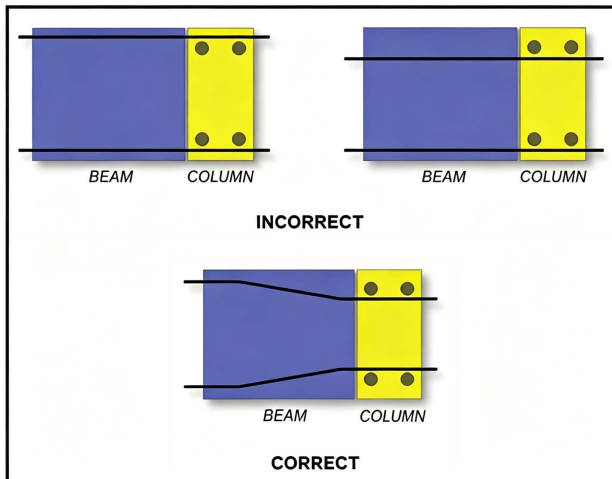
Various positions of steel beams within the core of the columns, viewed from above
